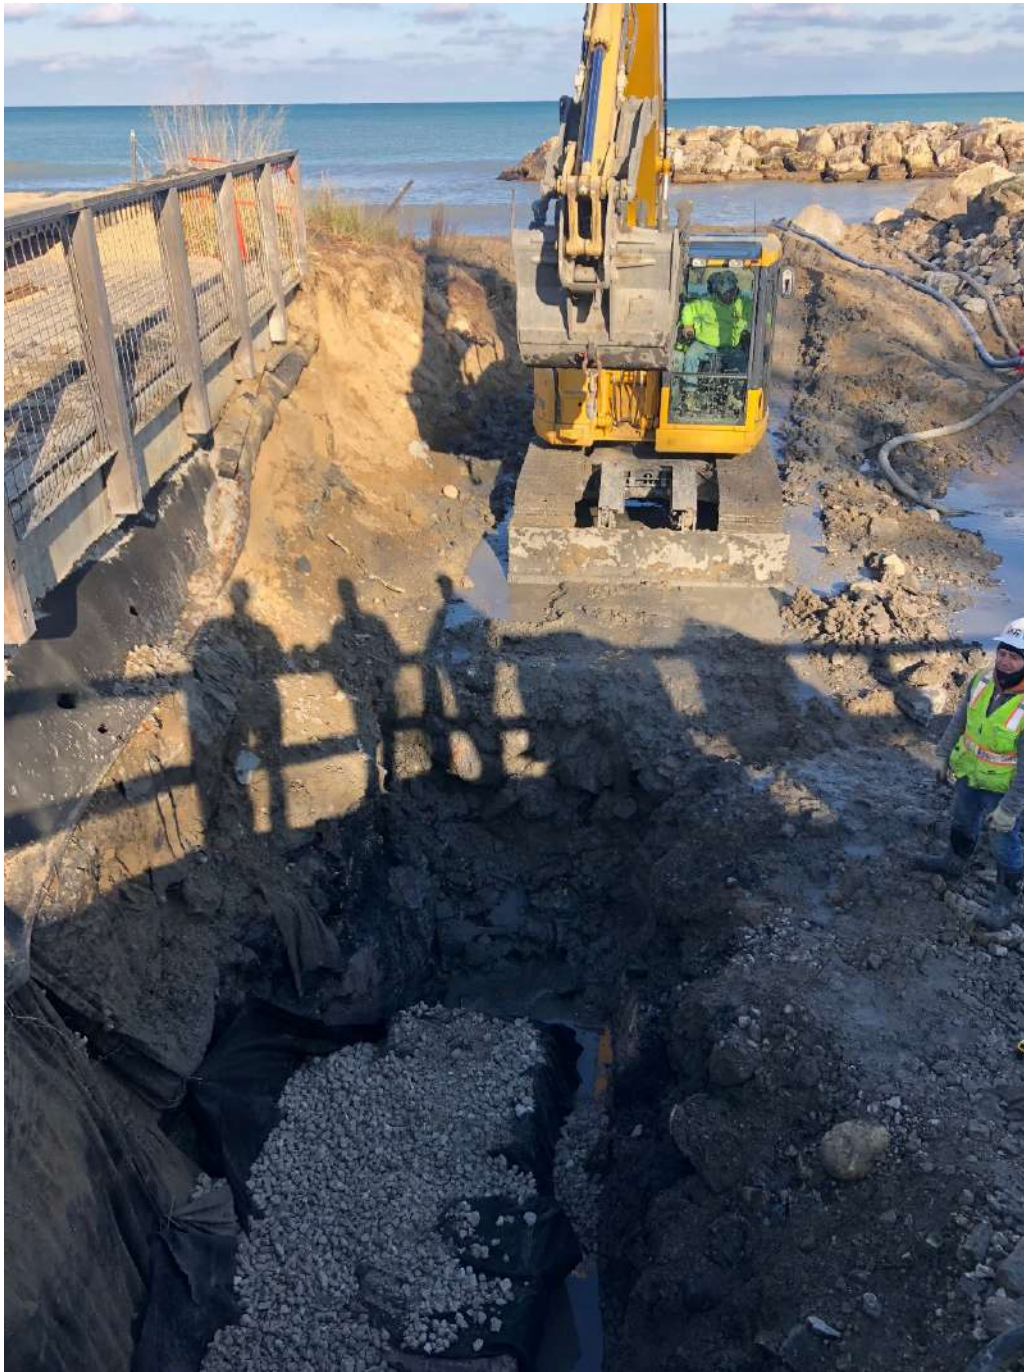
Construction Photo USACE Ravine Repair, October 20, 2018
